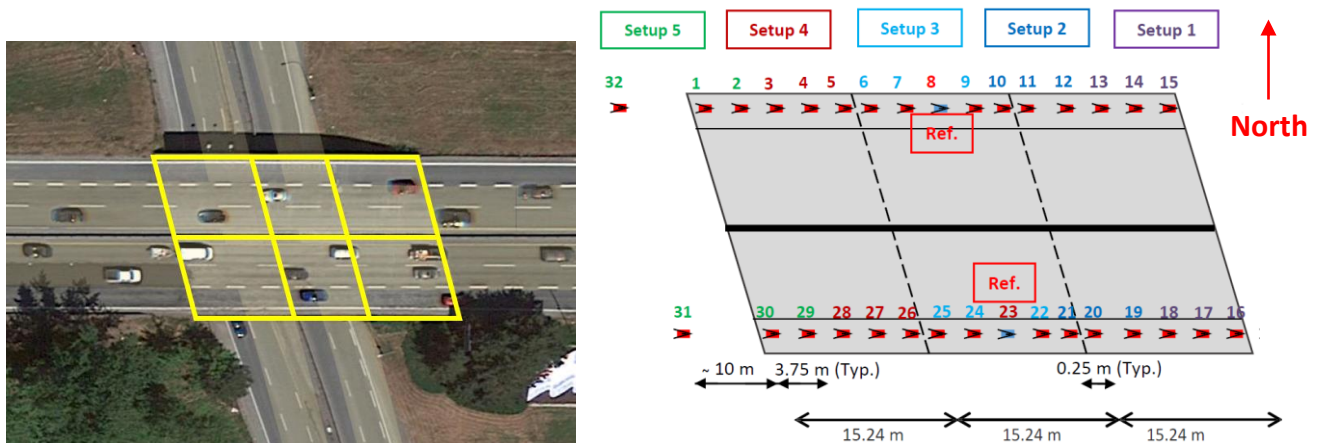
Bridge components highlighted as 6 separate decks and Layout of the sensors on the bridge deck
